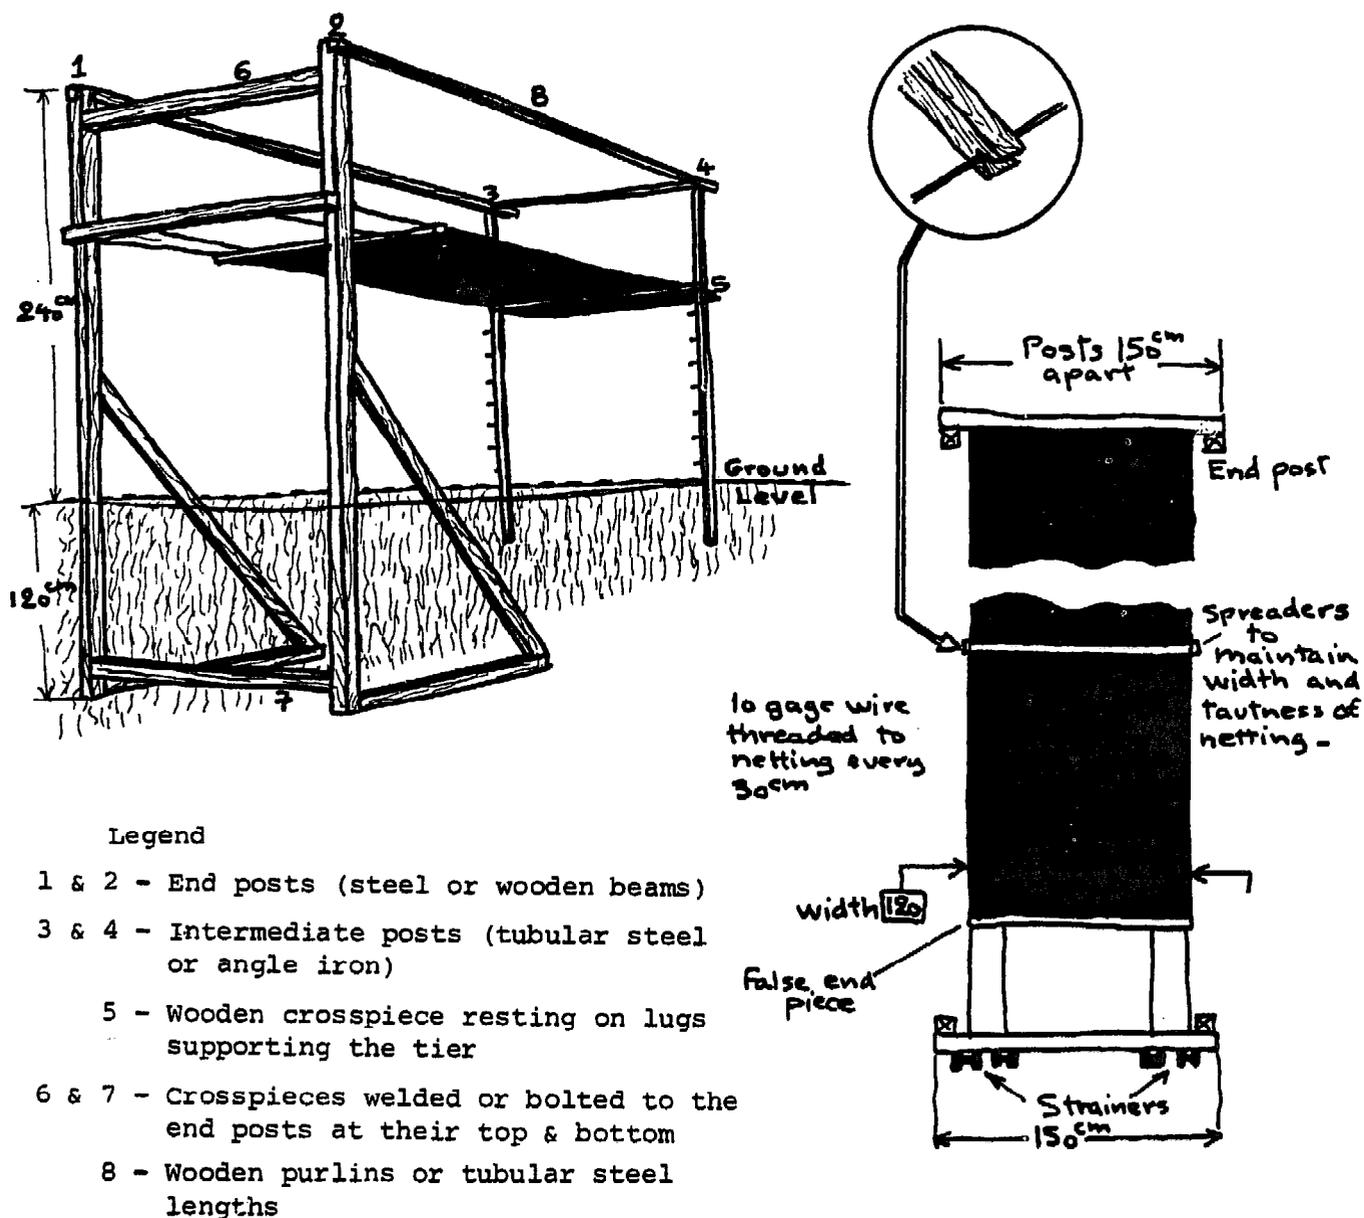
A widely used method for the construction of the drying racks for grapes.
